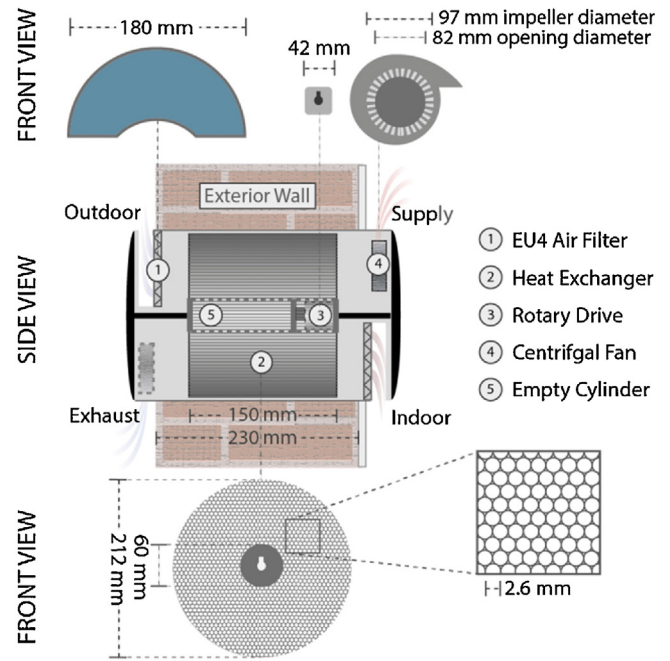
Detailed drawing of the developed DVU prototype with a polycarbonate honeycomb rotary heat exchanger.
